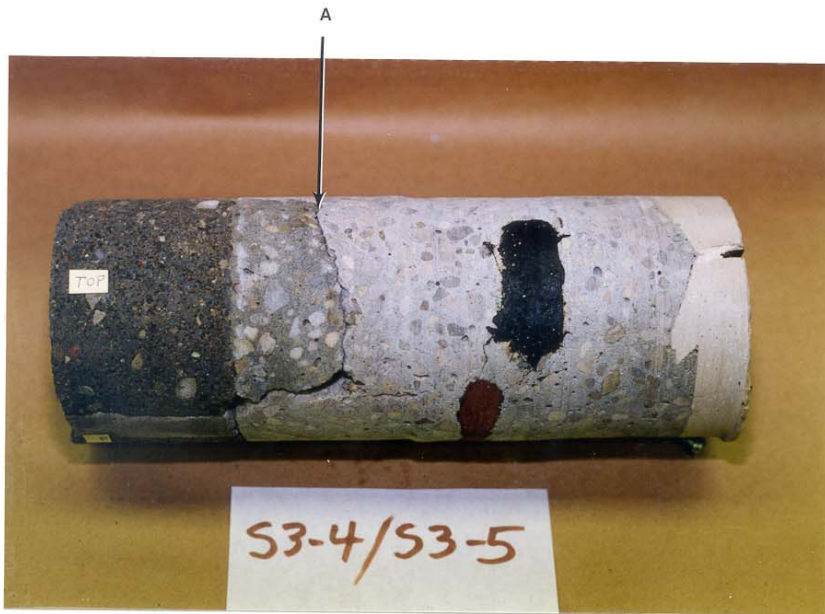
"A" shrinkage of thermal crack starting at a mortar joint.
